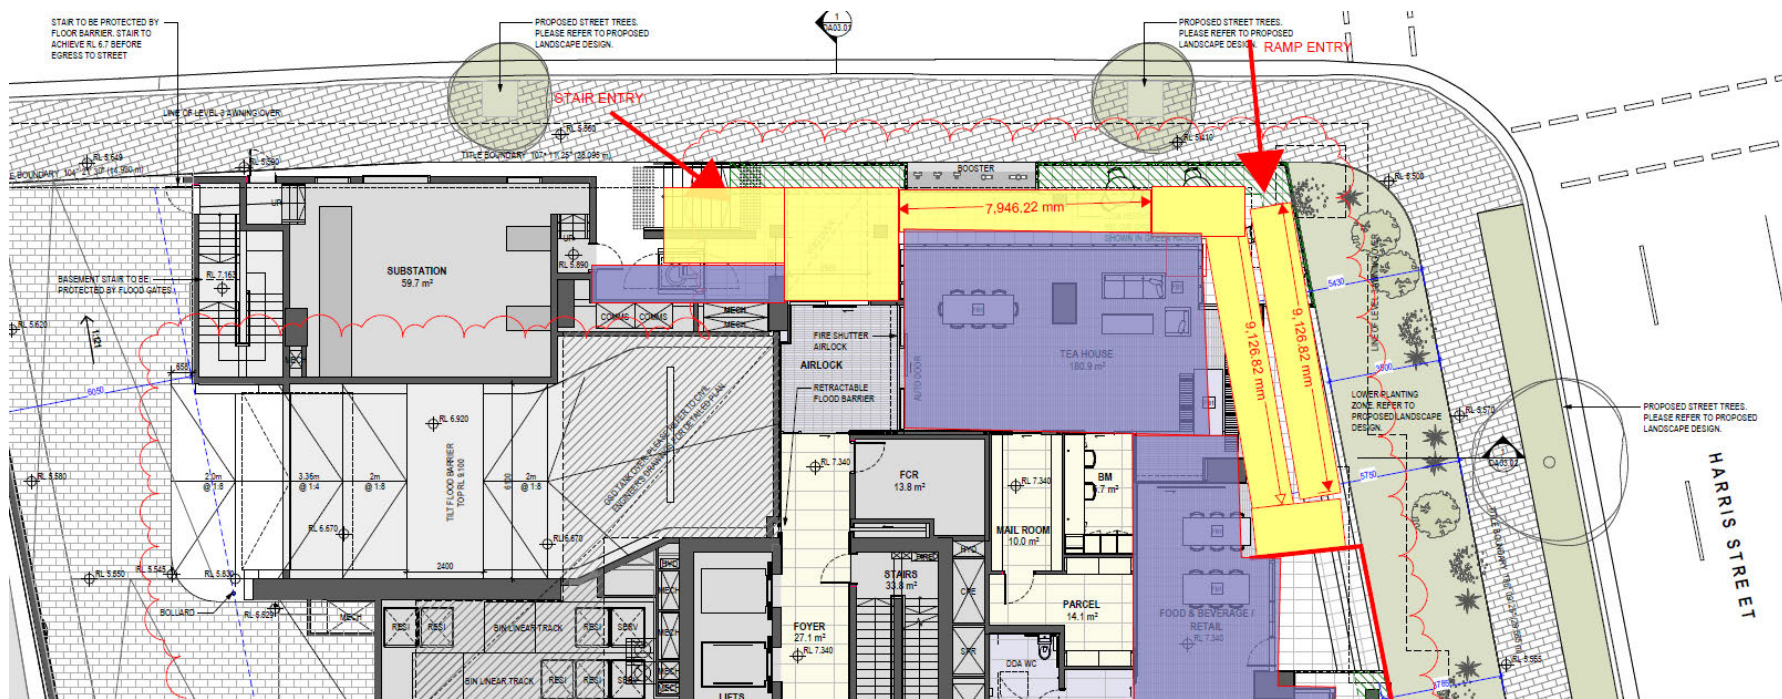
| Indicative Ramp Diagram to provide ramp access to Hassell Street
